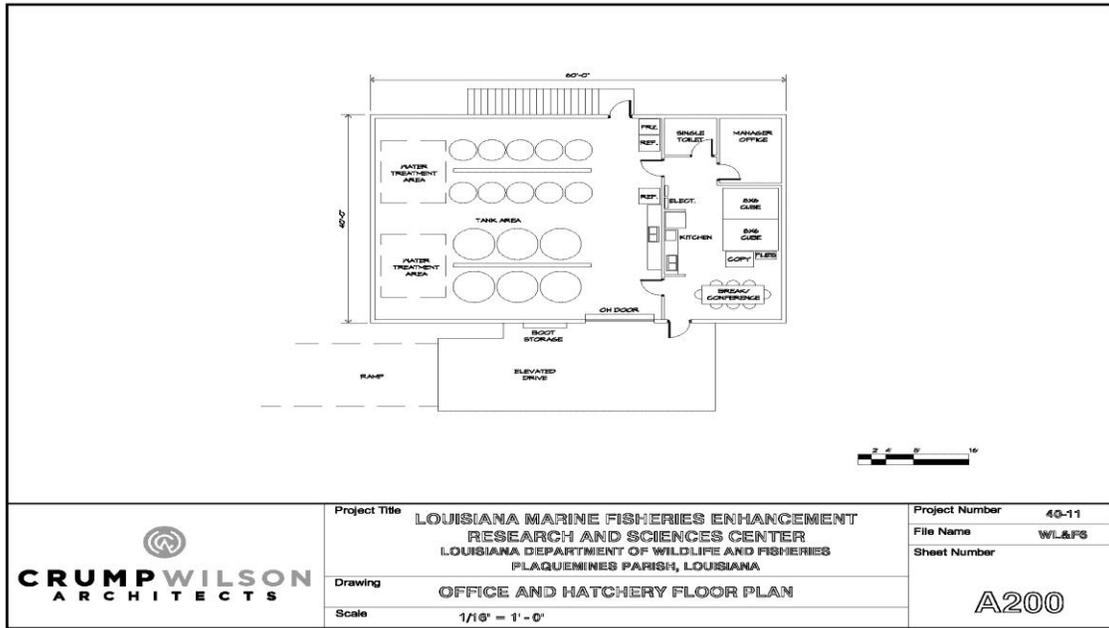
Floor plan for the Plaquemines Parish facility.
